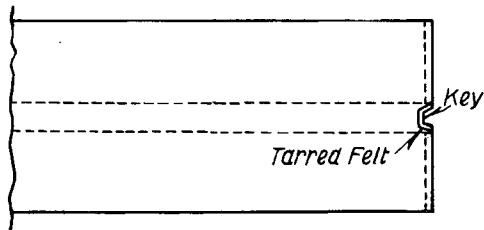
Plan Showing Expansion Joint in Main Longitudinal Barrier Wall
